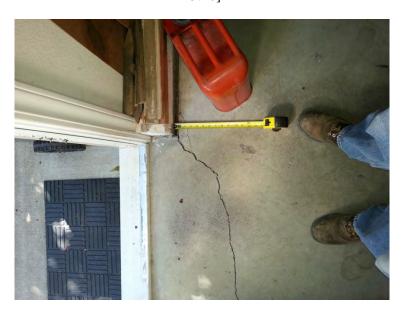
Cracked slab and separation from footing. [NSF-GEER; N 38.3126 W 122.3431; 08/28/14, 15:20]
